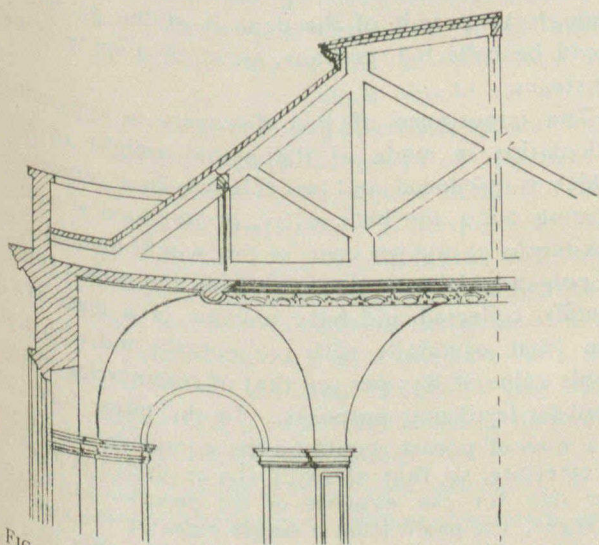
SECTION OF CEILING OF ALL HALLOWS, LOMBARD STREET.
